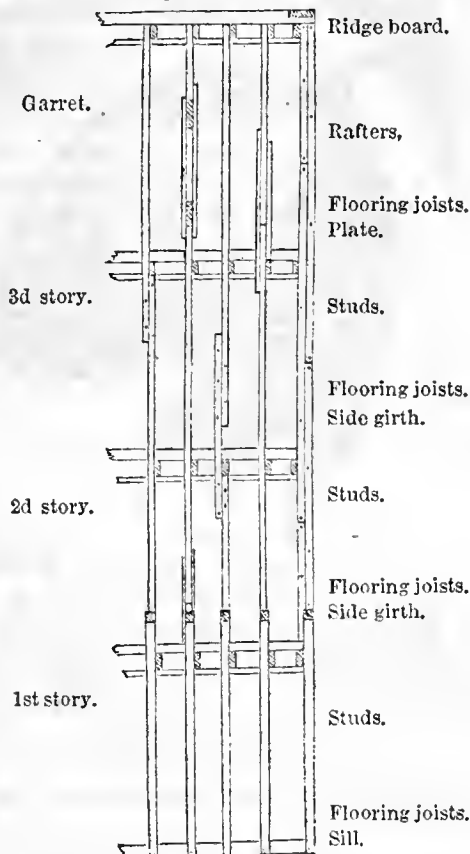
BALLOON FRAMING—THREE STORY BUILDING.
